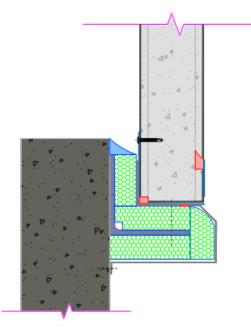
Base detail to wrapped steel angle – vertical and horizontal panel
